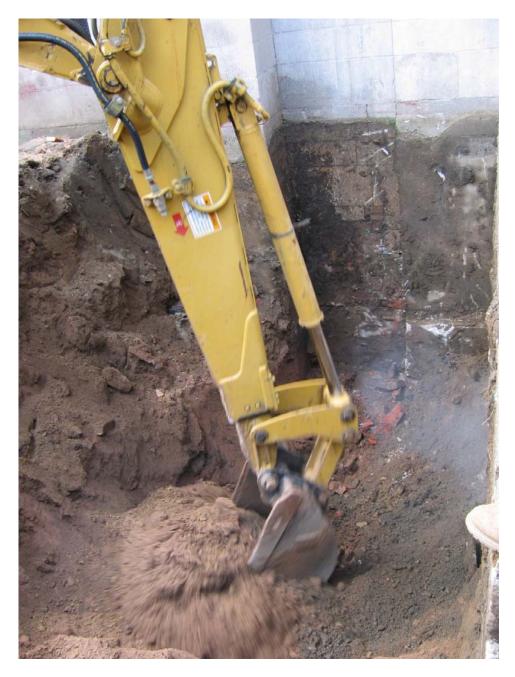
Columbus Park Pavilion - Brick Foundation Wall
